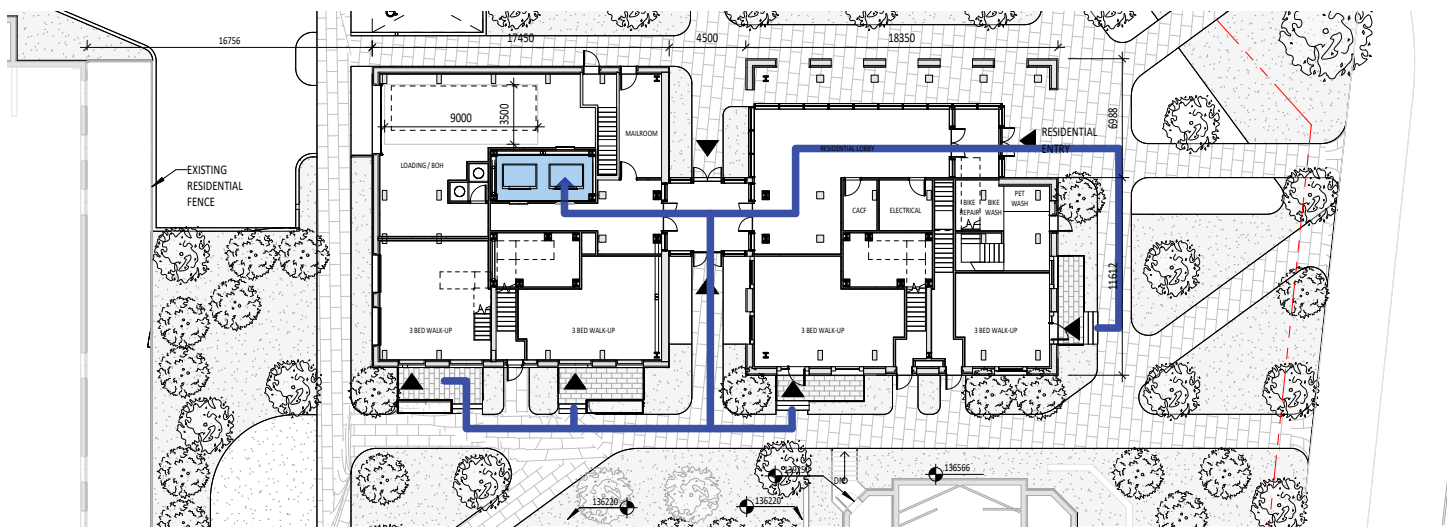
Building 1 Ground Floor - Townhome Pedestrian Route to Garbage Collection & Storage Room
